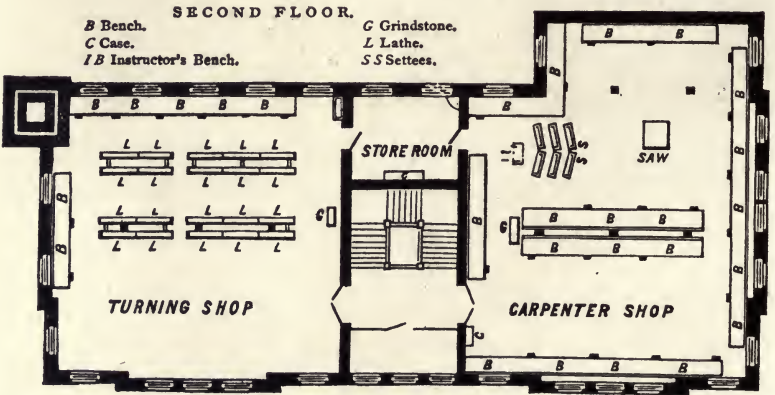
SECOND-FLOOR PLAN, ST. LOUIS MANUAL TRAINING SCHOOL
